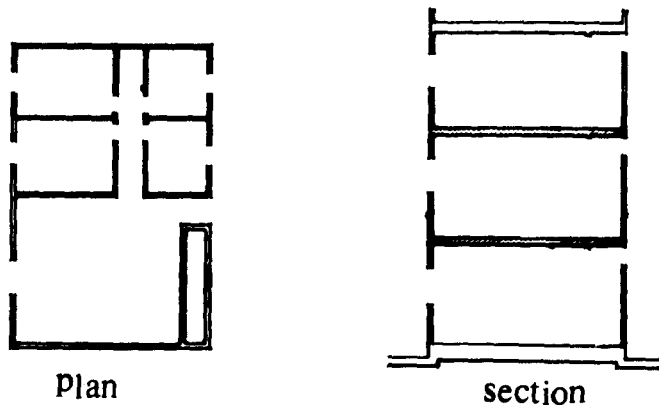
Plan and section of a typical low-cost dwelling in Egypt.
